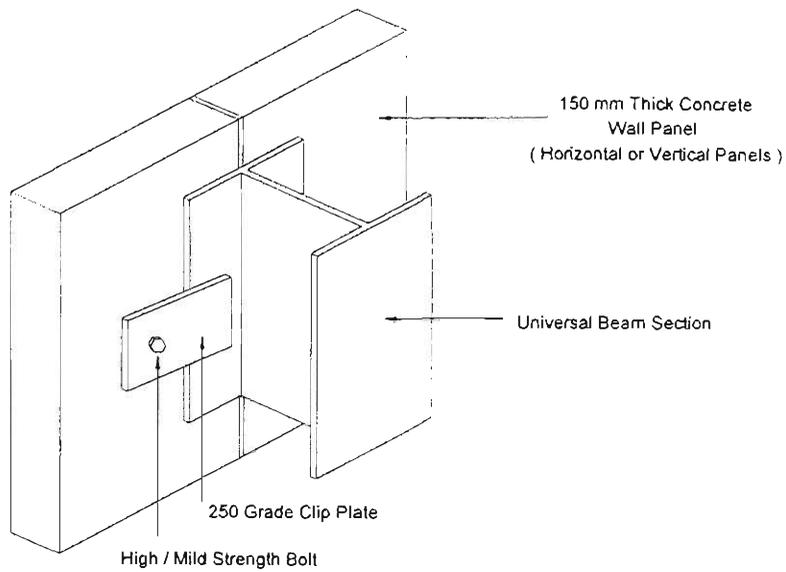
Typical Steel Clip Plate Bearing Connection
